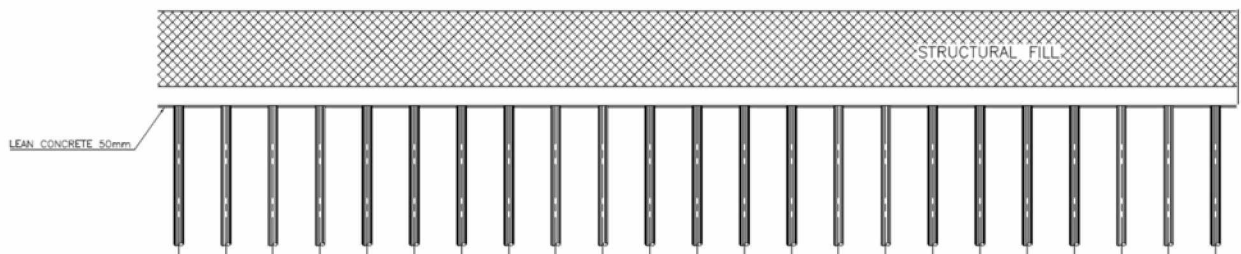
Soil Improvement with concrete rigid inclusions and distribution concrete slabs
